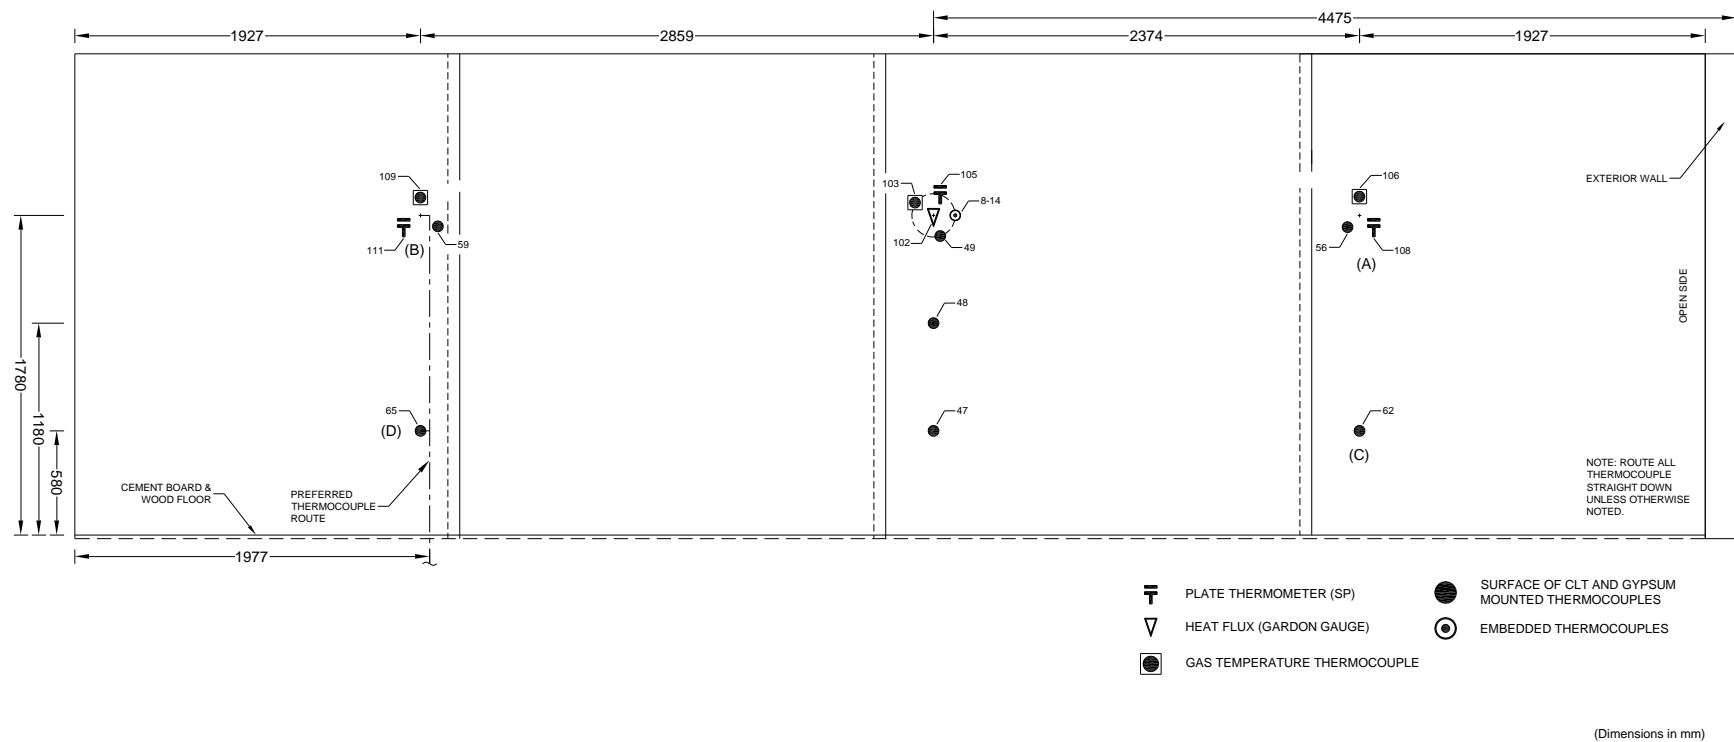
Test 1-3 Large Compartment CLT - W1 - Instrumentation Layout
